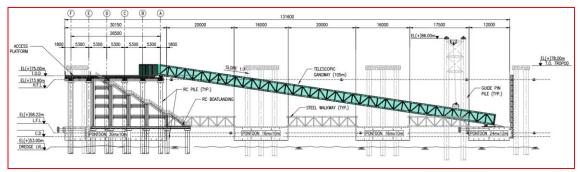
Typical Cross-section of Berthing facility at Low Flood level (+) 58.22m CD
